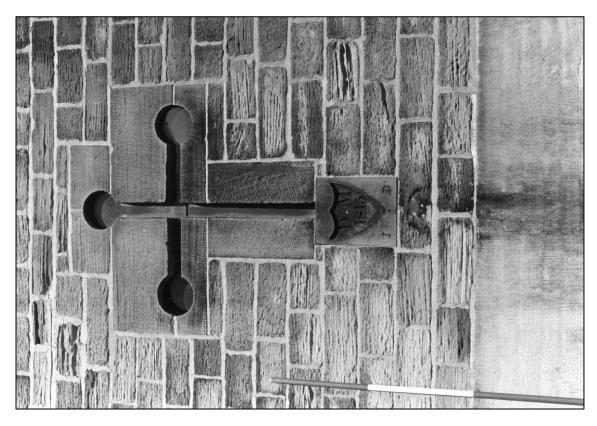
Date stone in south elevation of north range, looking N (photo 3/13) (top to left).
